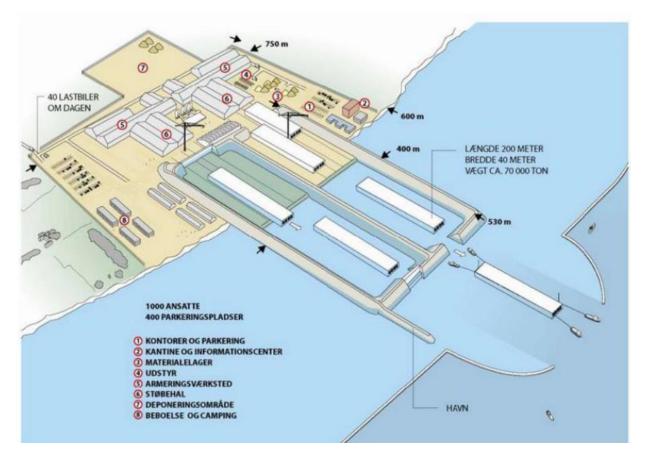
The Fehmarn Tunnel production facility is an example of a dedicated mass production of large concrete structures
